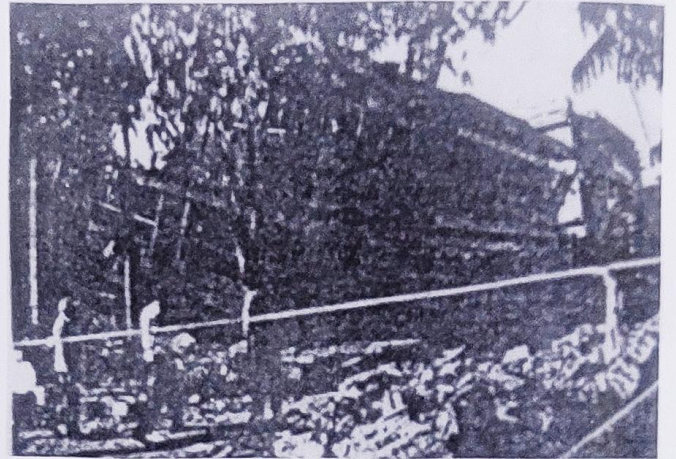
Complete collapse of apartment building in Ahmedabad, a building with an open ground story and poor reinforcement detailing
